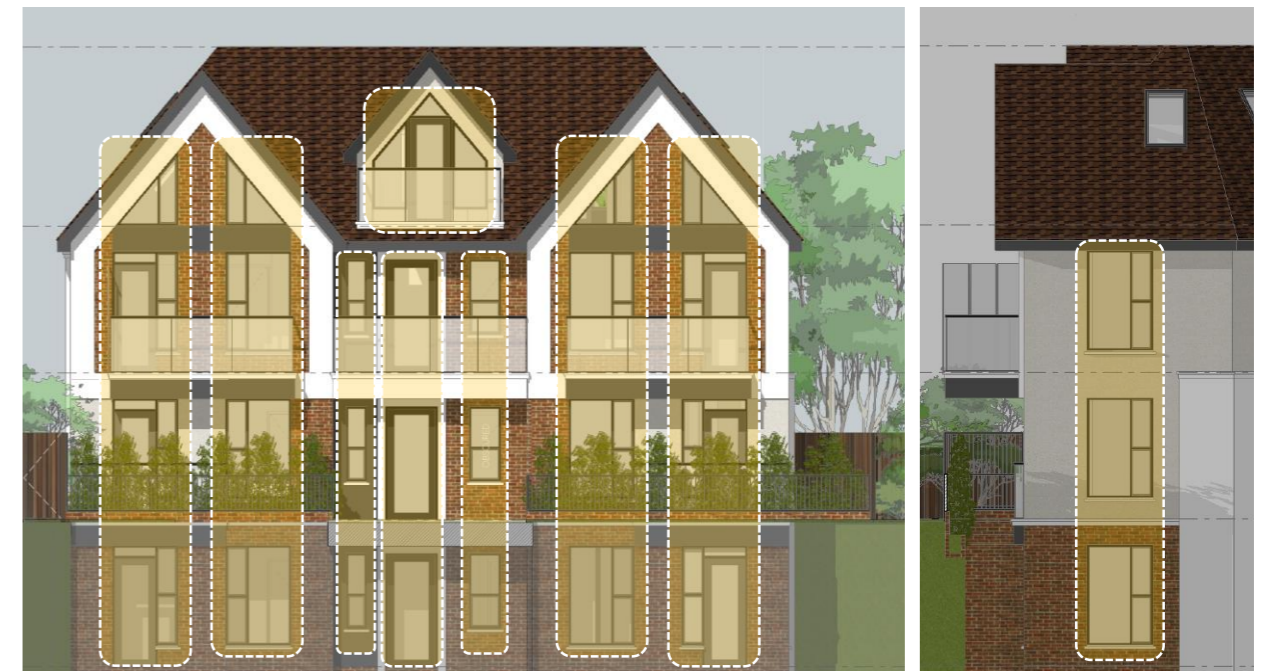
Front and Side Elevation. Highlighted windows getting much daylight.
